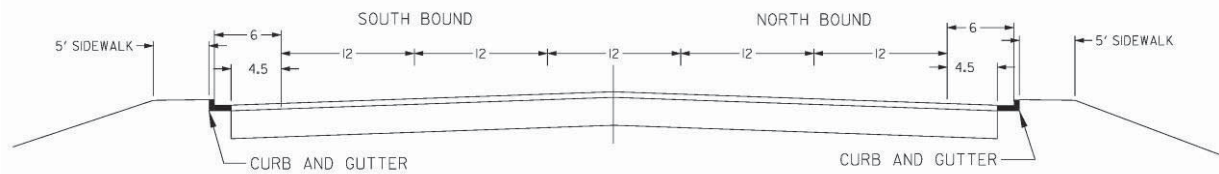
Typical Section: Four-lane Highway with Center Turn Lane, Curb, Gutter and Sidewalk
